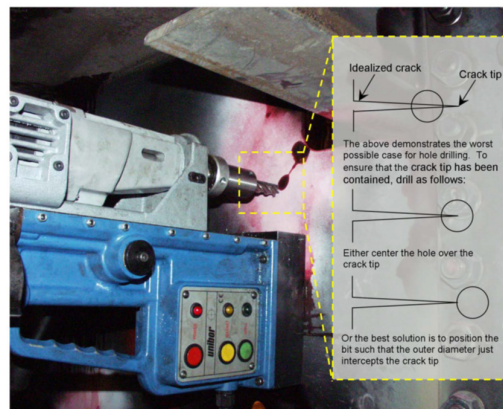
Hole-drilling and proper positioning for crack containment (Dexter & Ocel, 2013)
